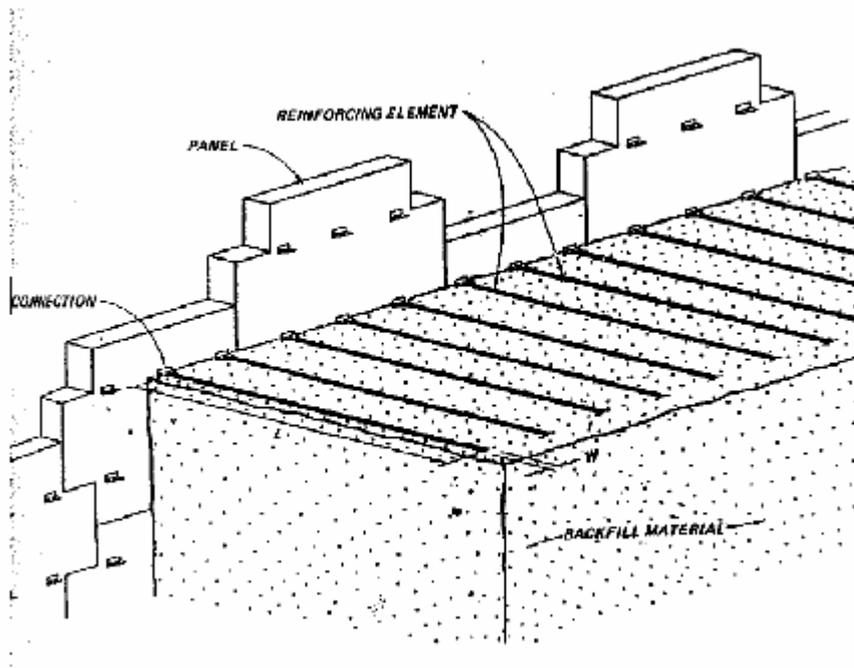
Schematic view of mechanically stabilized earth (MSE) wall
